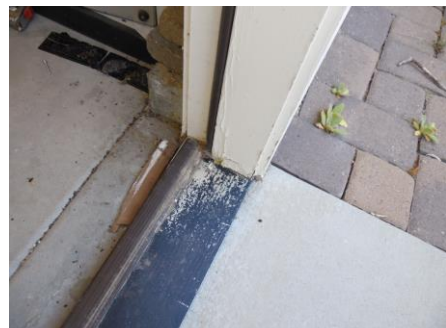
WATER ENTRY OCCURS AT DOOR/THRESHOLD. GARAGE MAN DOOR- WEST
